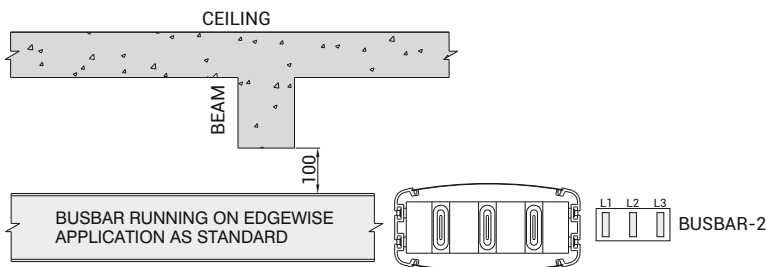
CROSSING UNDER A BEAM ON EDGEWISE APPLICATION
